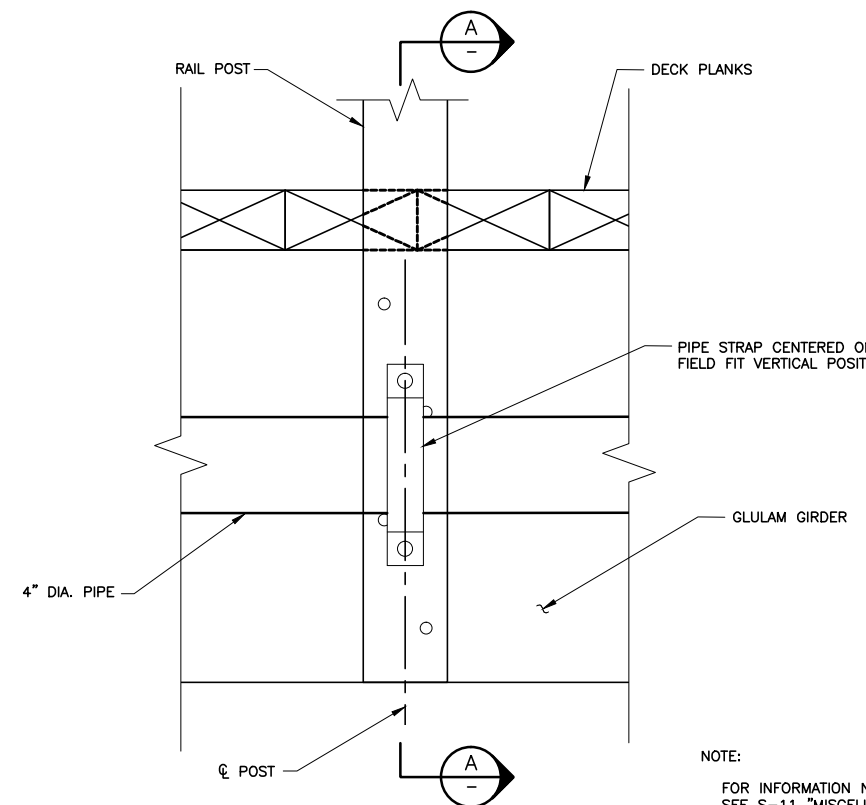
PIPE STRAP TO (E) BRIDGE
